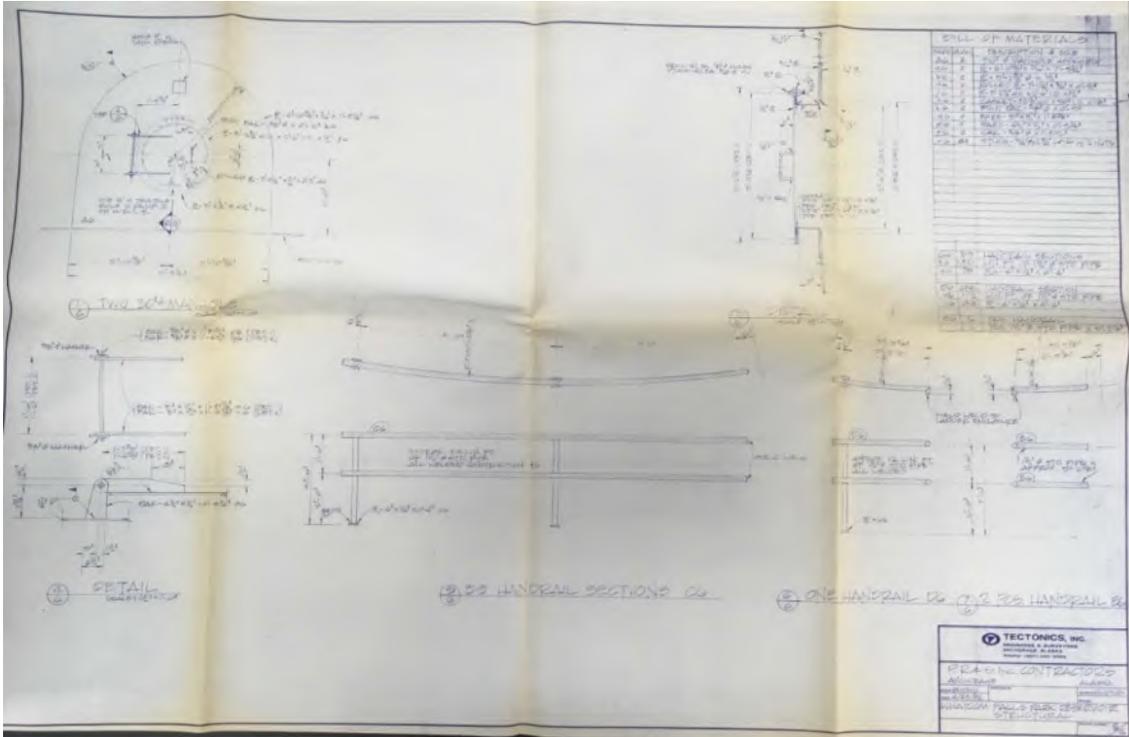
Whatcom Falls 1 – Manway and Railing Details
